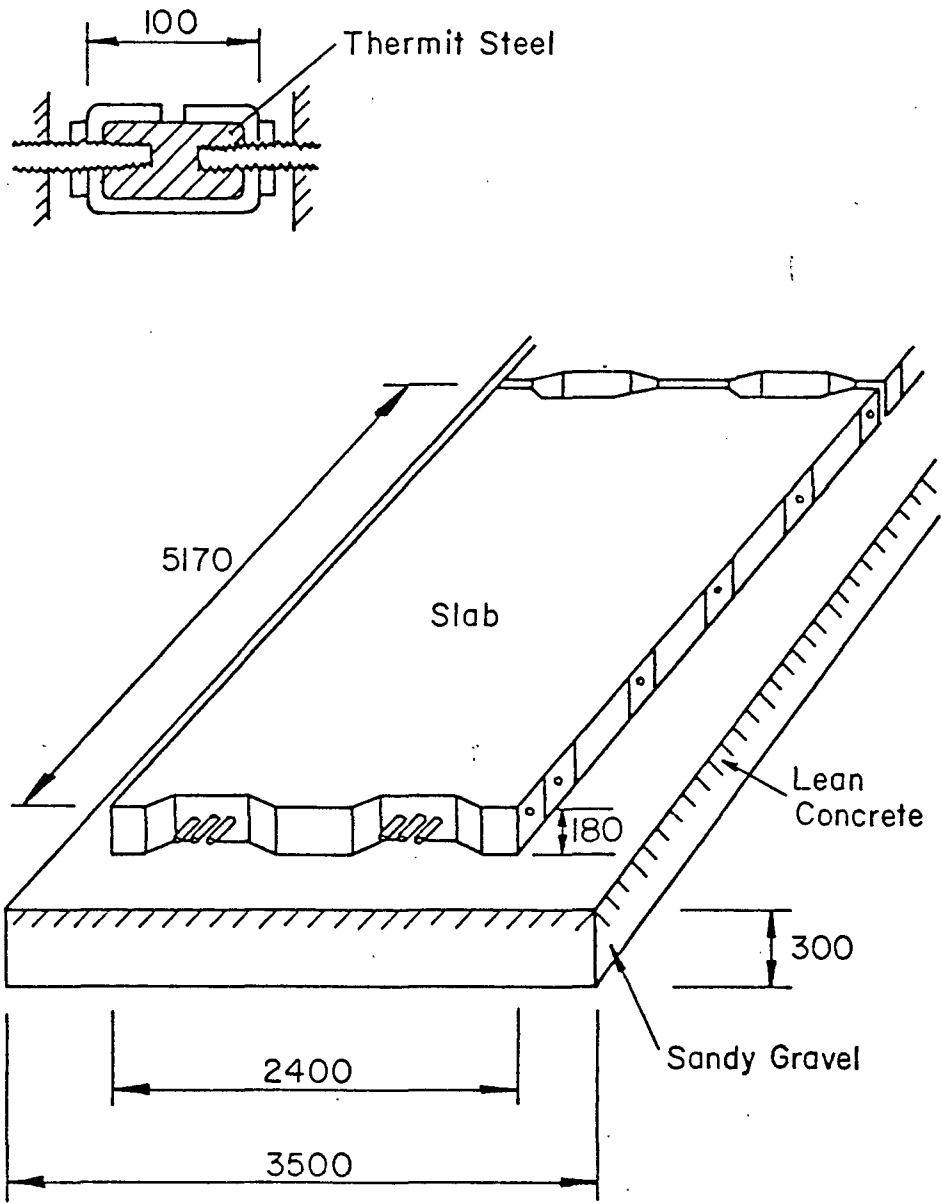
Concrete Slab Tested by the German Federal Railways (DB)
